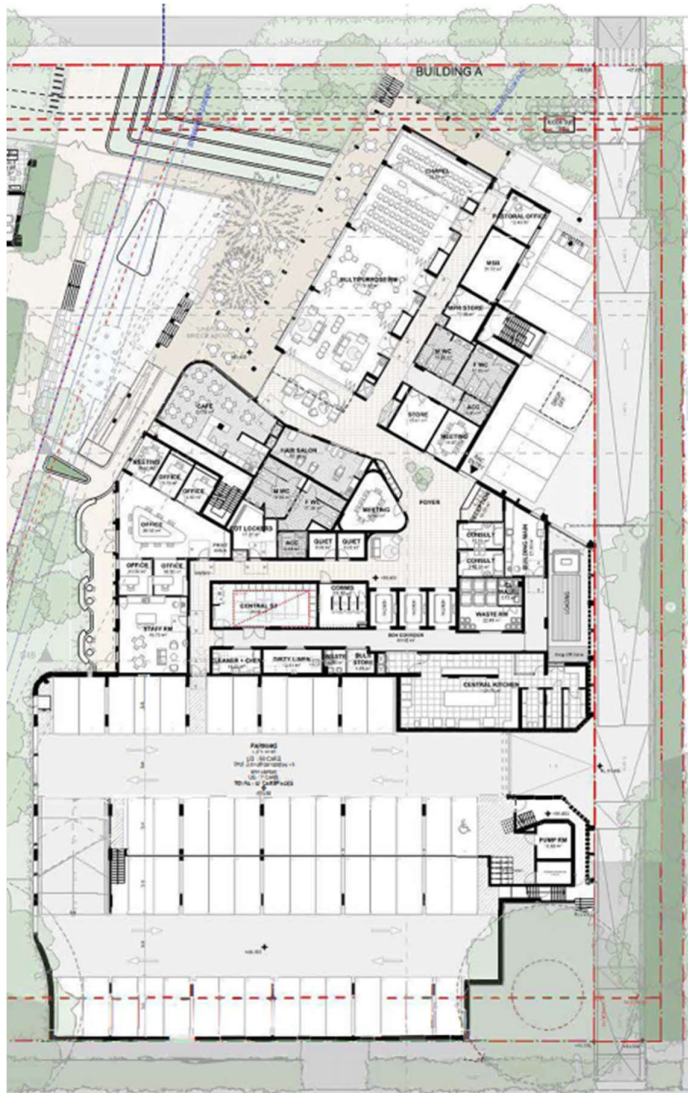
Approved and Proposed Lower Ground Level Stage - 02 of Building A (2 of 2)
